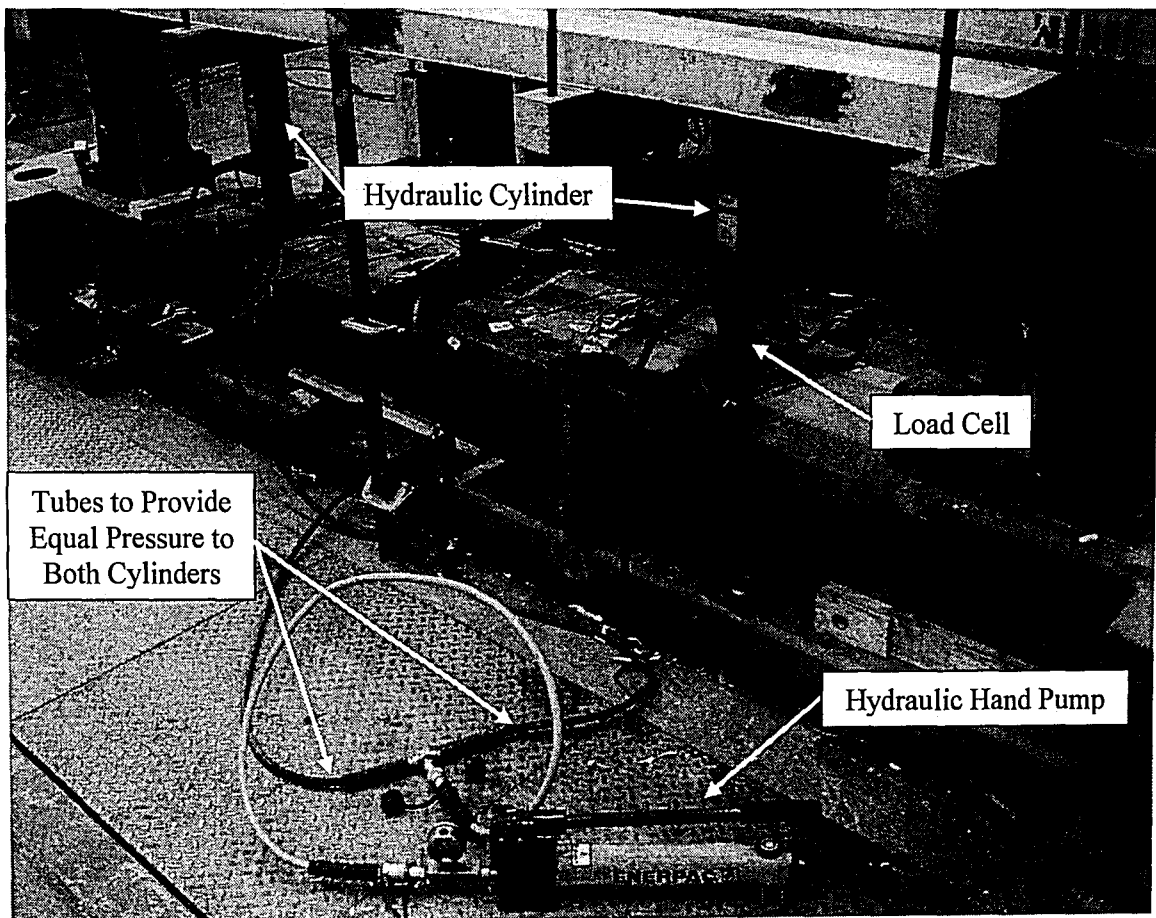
View of the Hydraulic Hand Pump and Hydraulic Cylinders
